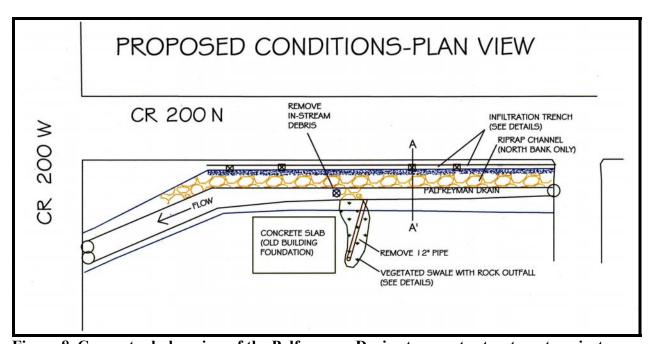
Conceptual plan view of the Palfreyman Drain stormwater treatment project.
